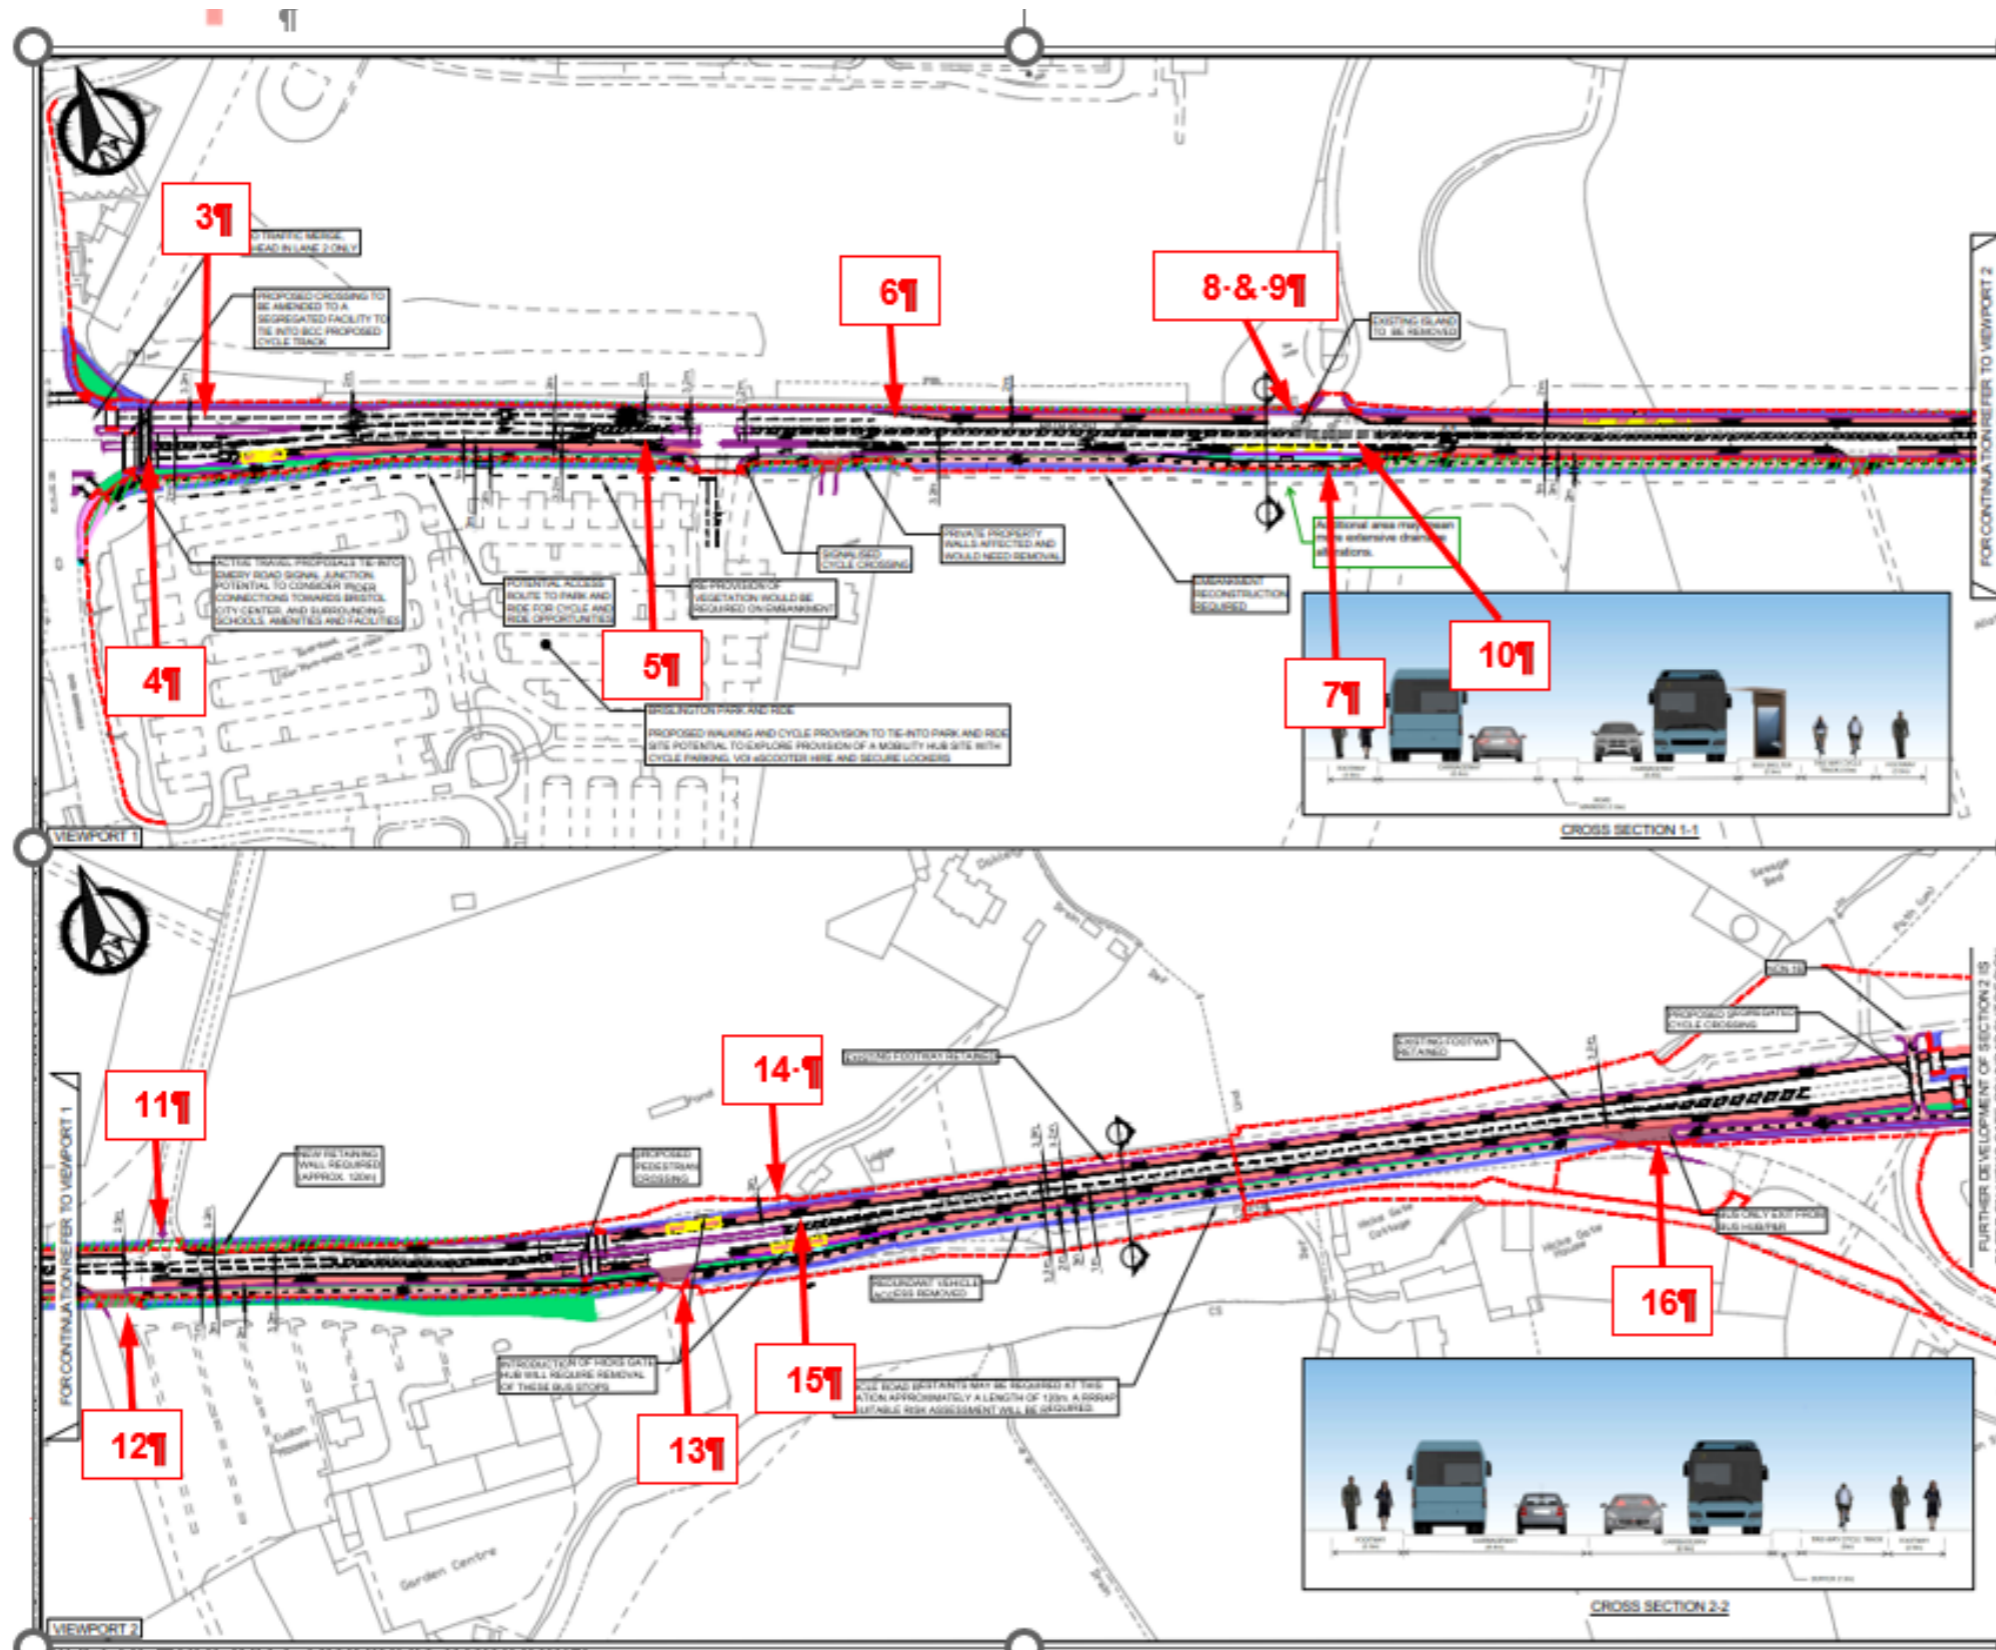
Section 3 Road Safety Audit Problem Location Plan
